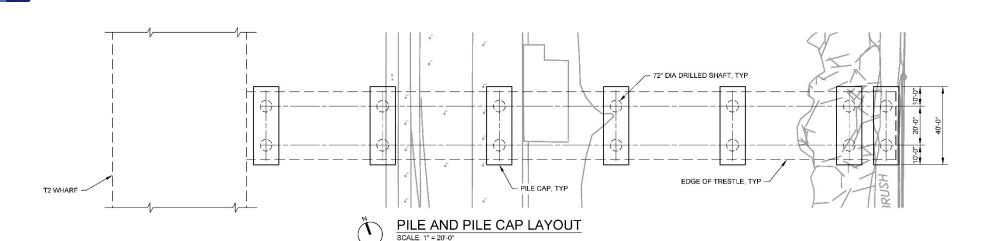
Pile Layout for T2 Access Trestles: Alternative 2B with 72-inch-diameter Drilled Shafts
